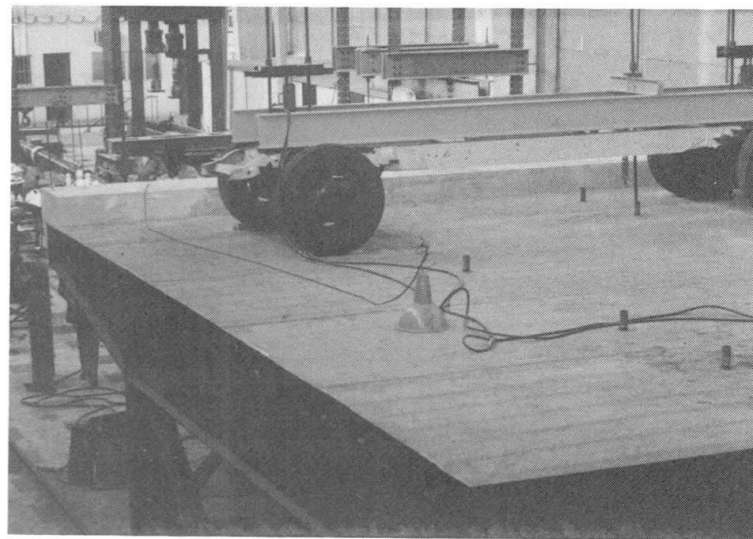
View of the prototype scale model of the deck at COPPE's Laboratory of Structures.
